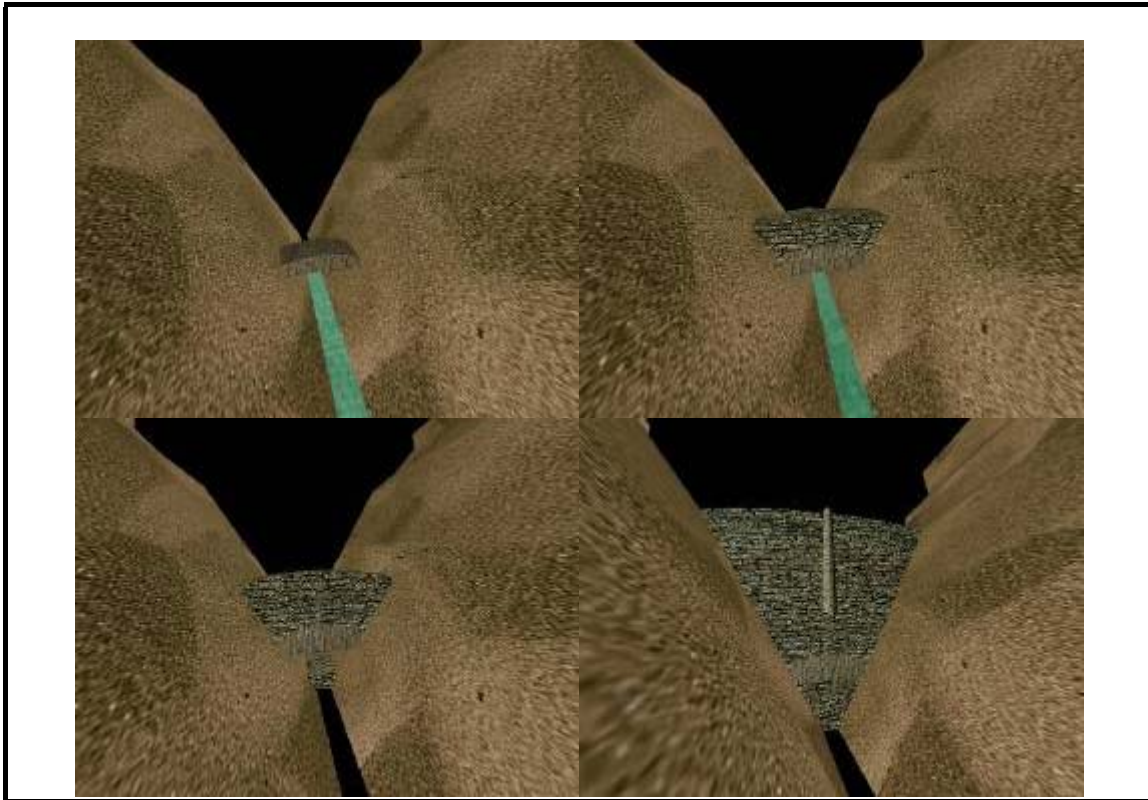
Construction of the dam on a brick arch to manage floods during construction
